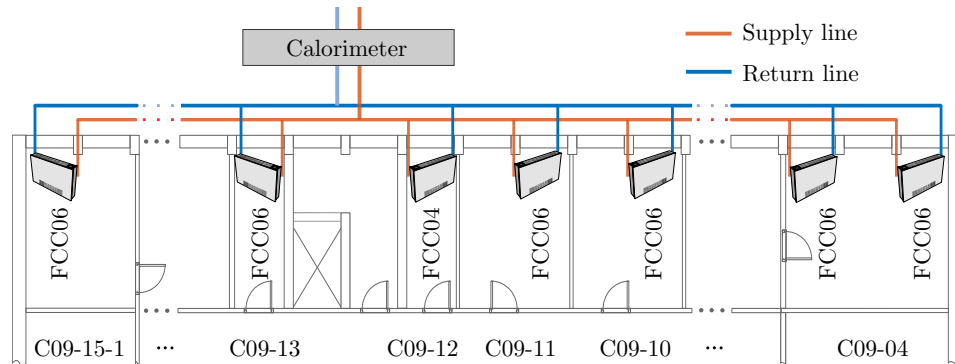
Layout of the southern supply duct on the 9th floor of the case-study building.
